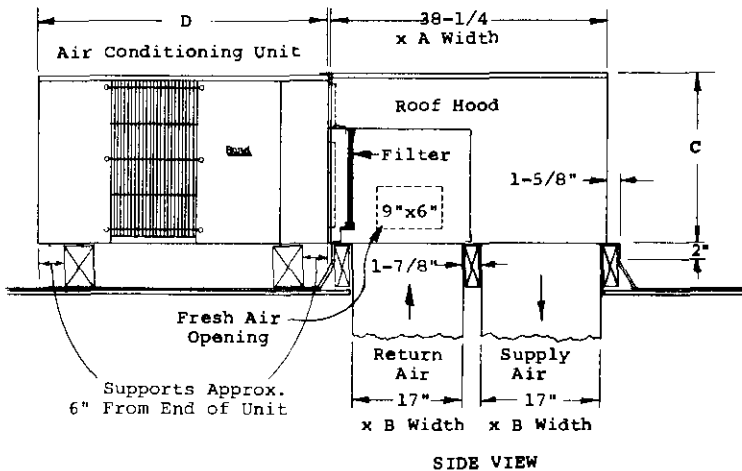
UNIT AND ROOF HOOD DETAILS
